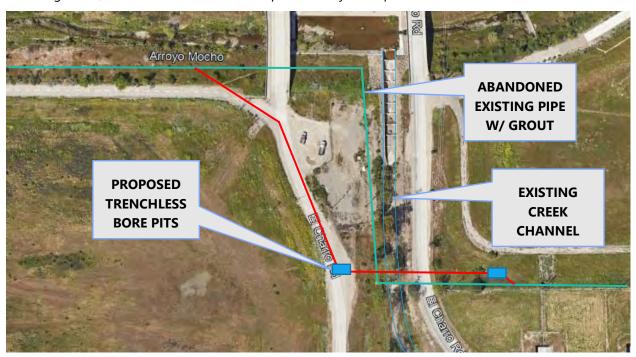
Proposed Trenchless Crossing and Pipe Realignment in the Arroyo Mocho Creek crossing. Adjacent to El Charro Rd
